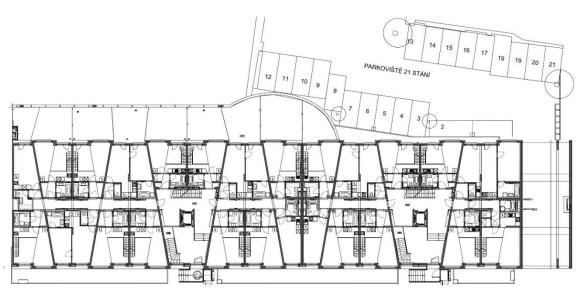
X-LOFT's ground floor plan. Source of the plan: ECOTEN s.r.o.
